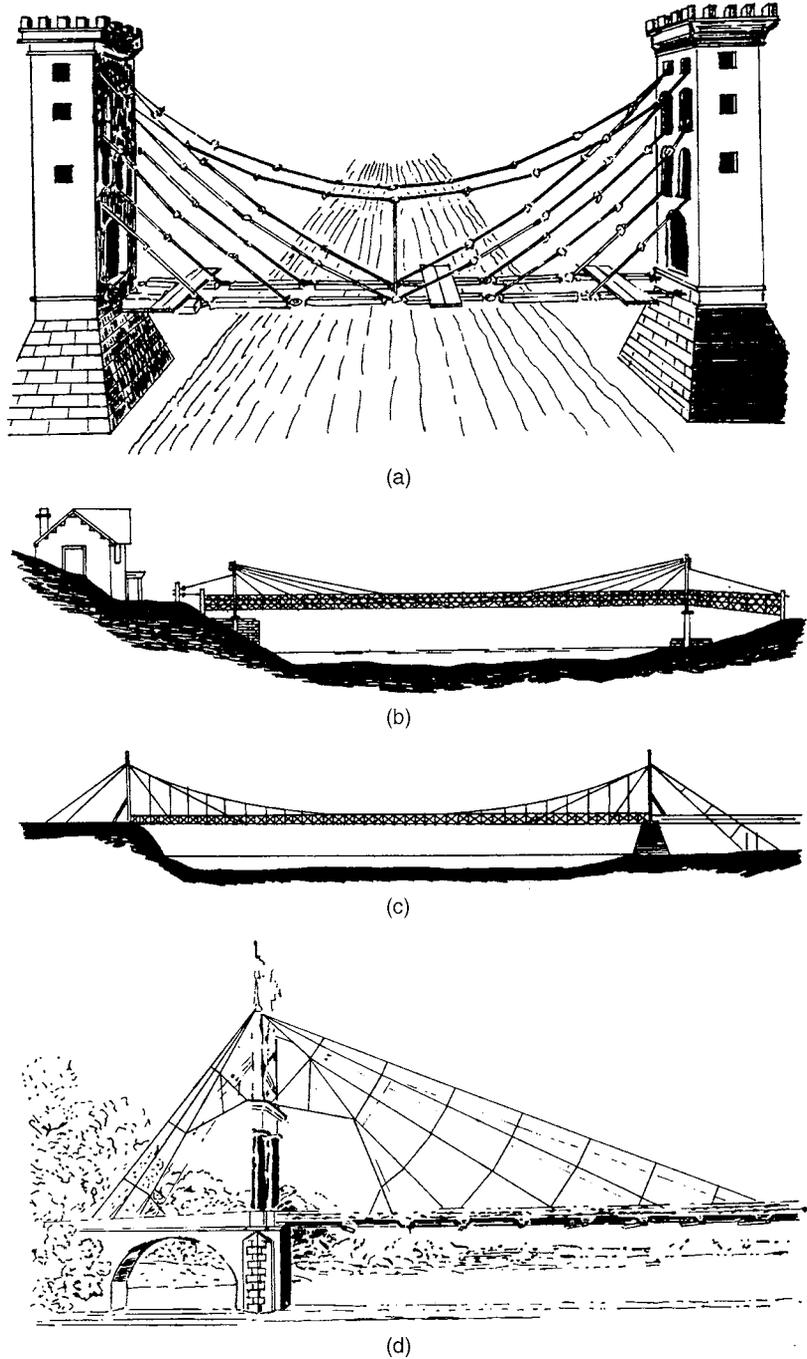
(a) Chain bridge by Faustus Verantius, 1607. (b) King's Meadow Footbridge. (c) Dryburgh Abbey Bridge. (d) Nienburg Bridge. (Reprinted with permission from K. Roik et al., "Schrägseilbrücken," Wilhelm Ernst & Sohn, Berlin.)
